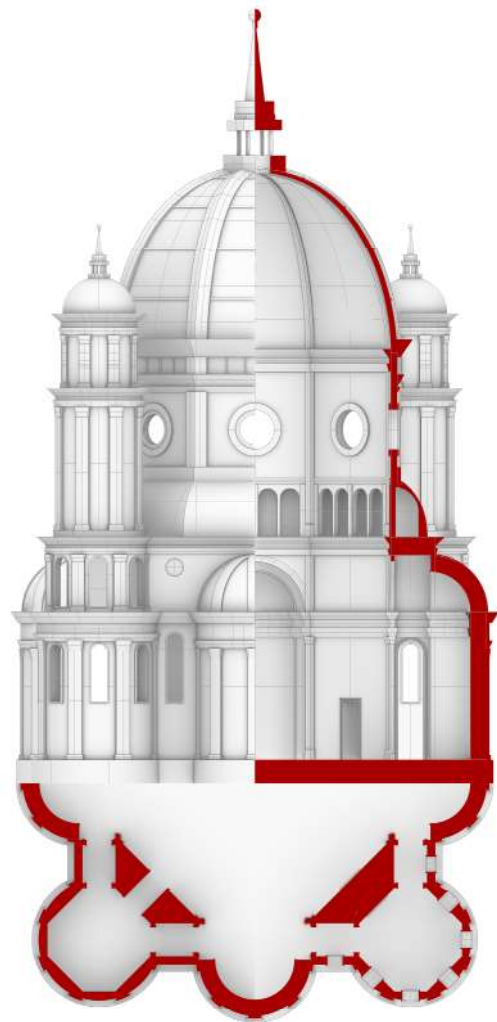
Plan, section and elevation of the solution derived from the bird's-eye view.
